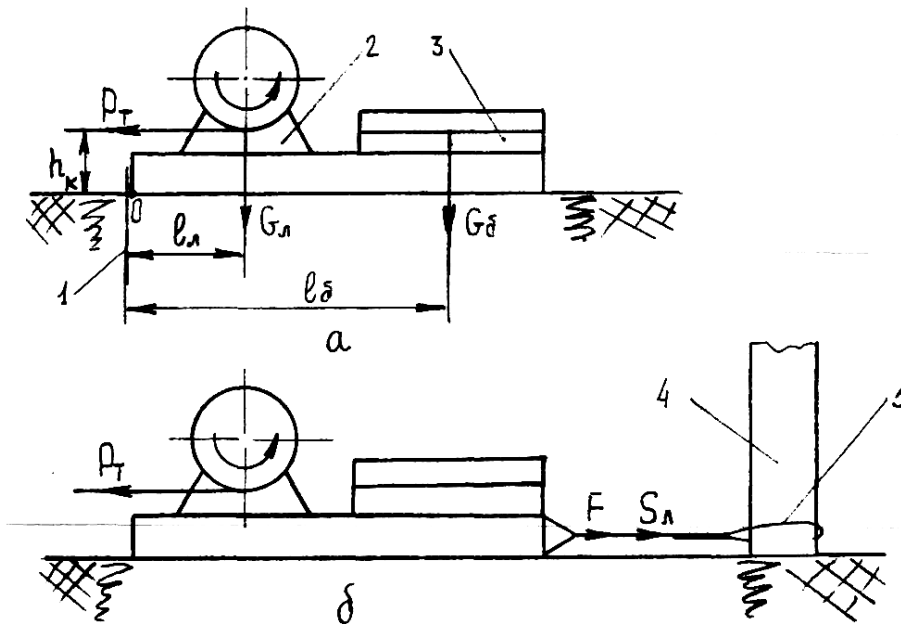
Schemes of securing the winch: 1 – emphasis; 2 – winch; 3 – ballast; 4 – column; 5 - strut.
